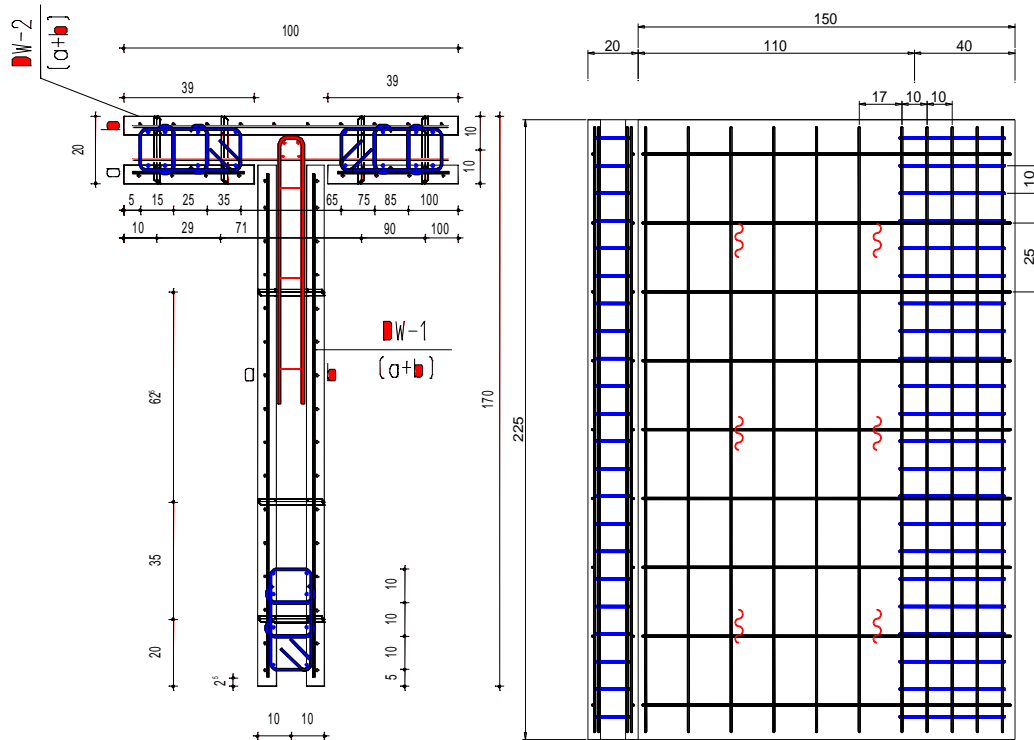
Details of Specimen 4 (Binici and Canbay, 2014)
